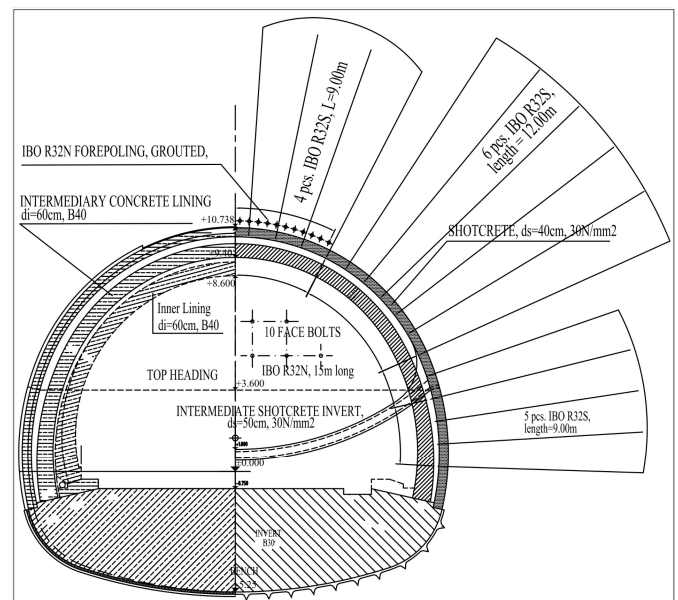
Option-3 cross section, support class design option with intermediate lining and in poor Flyschoid Series in clayey fault gauges. Excavation area 245m².
